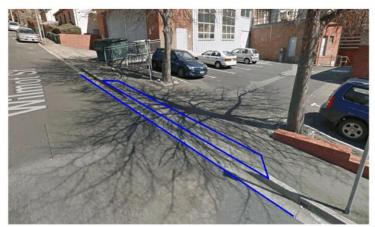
Existing Driveway on Wilmot Street to be upgraded and widened
